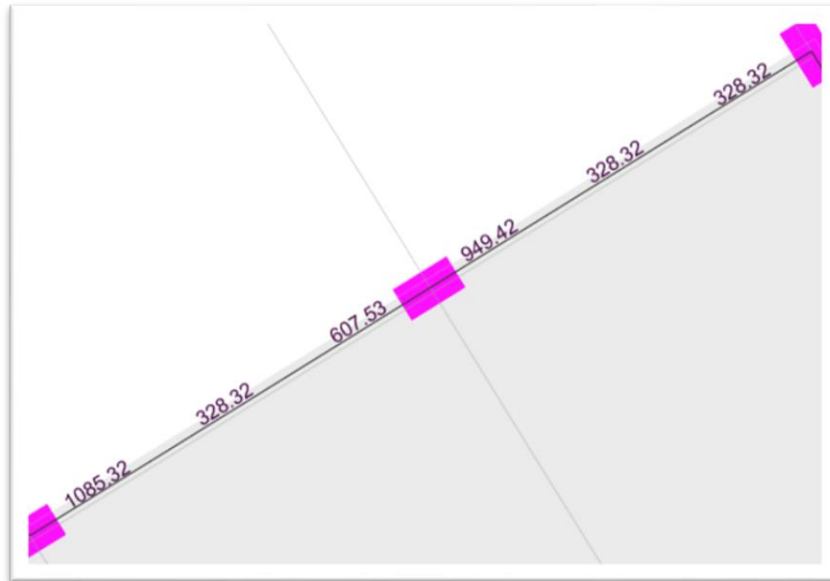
Shear plus torsion reinforcement for beam B7 & B8 in ETABS.
